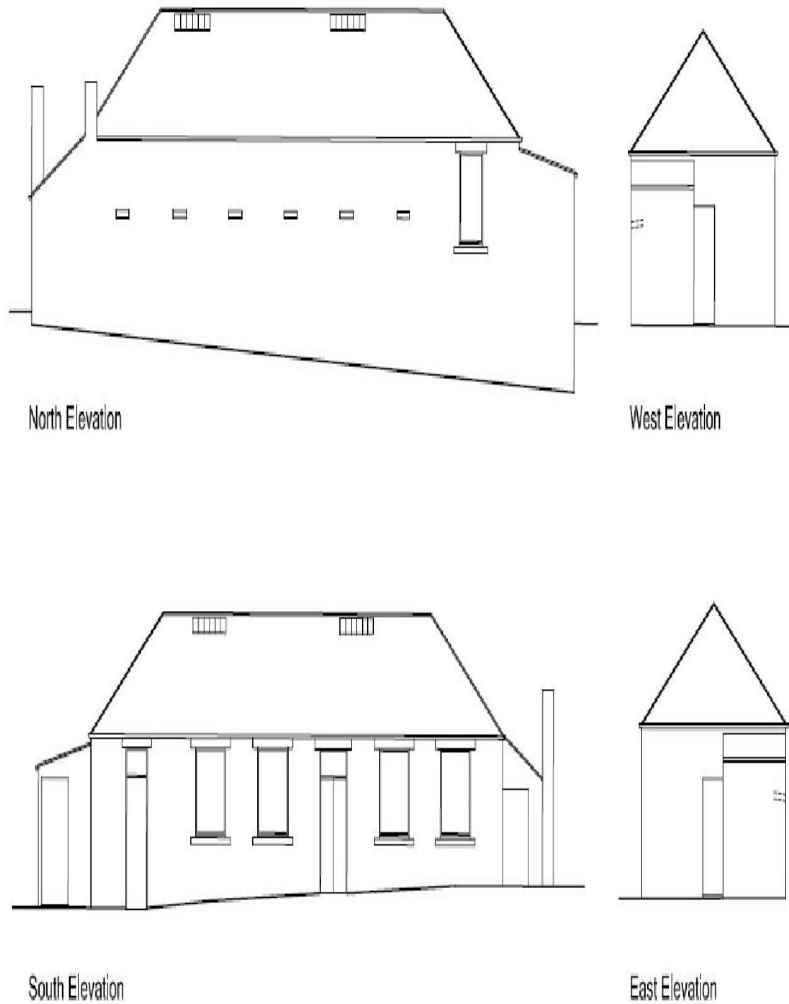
Existing Farmhouse Elevations: Noting the proposed drawings take a similar design approach
